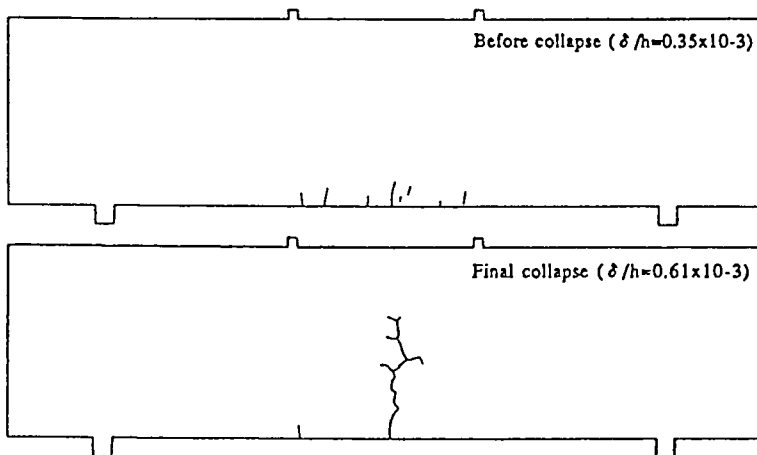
Crack patterns of plain concrete beams (the same number of element)
